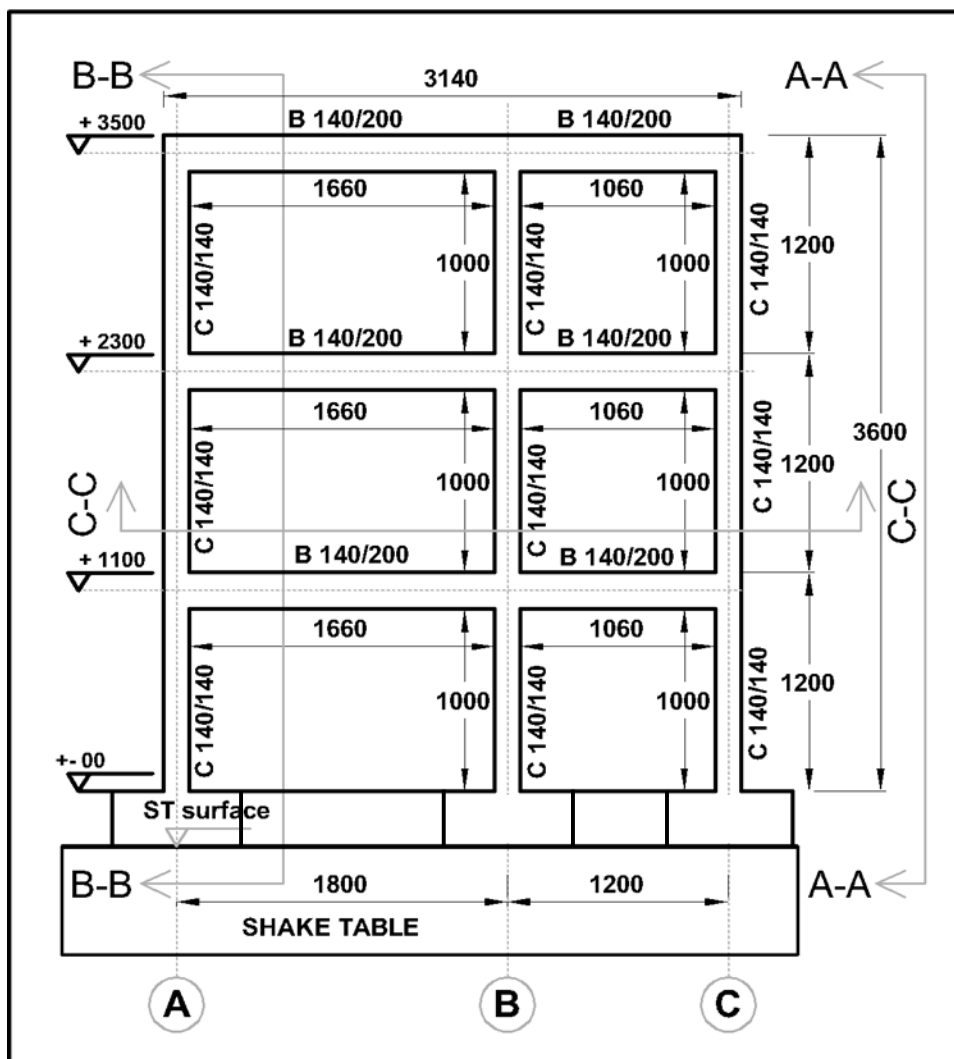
Specimen main dimensions (in millimeters) and reinforcing layout.
